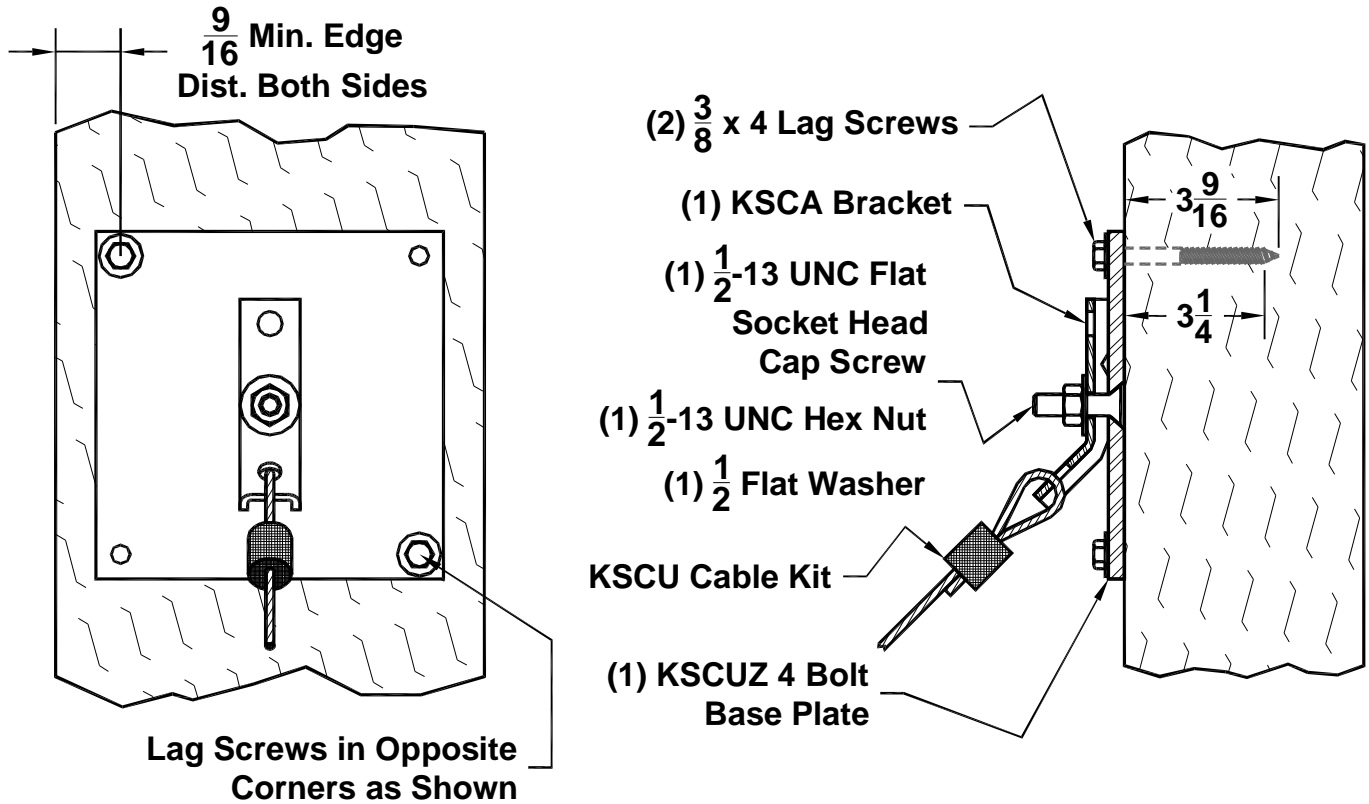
; Model KSCUZ2 Attachment Kit to a Wooden Column Using the KSCA Bracket – (2) $\frac{3}{8}$ Lag Screws
